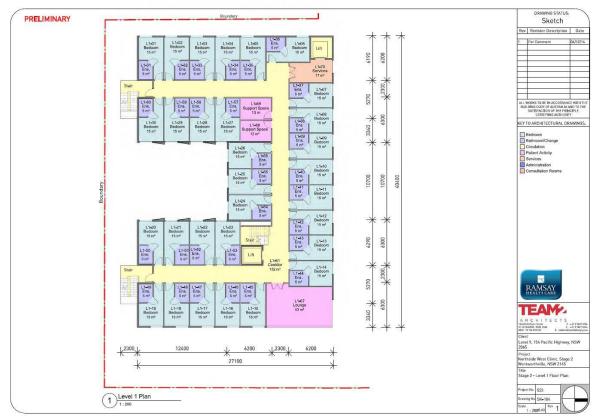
In-Patient Floor Indicative Layout Plan (Level 1 and 2 identical layout)
